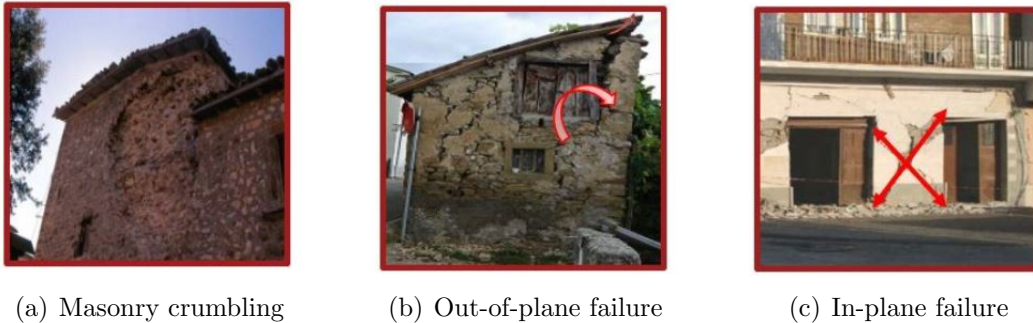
Failure mechanisms of masonry structures ([Gatta, 2019](#)).
